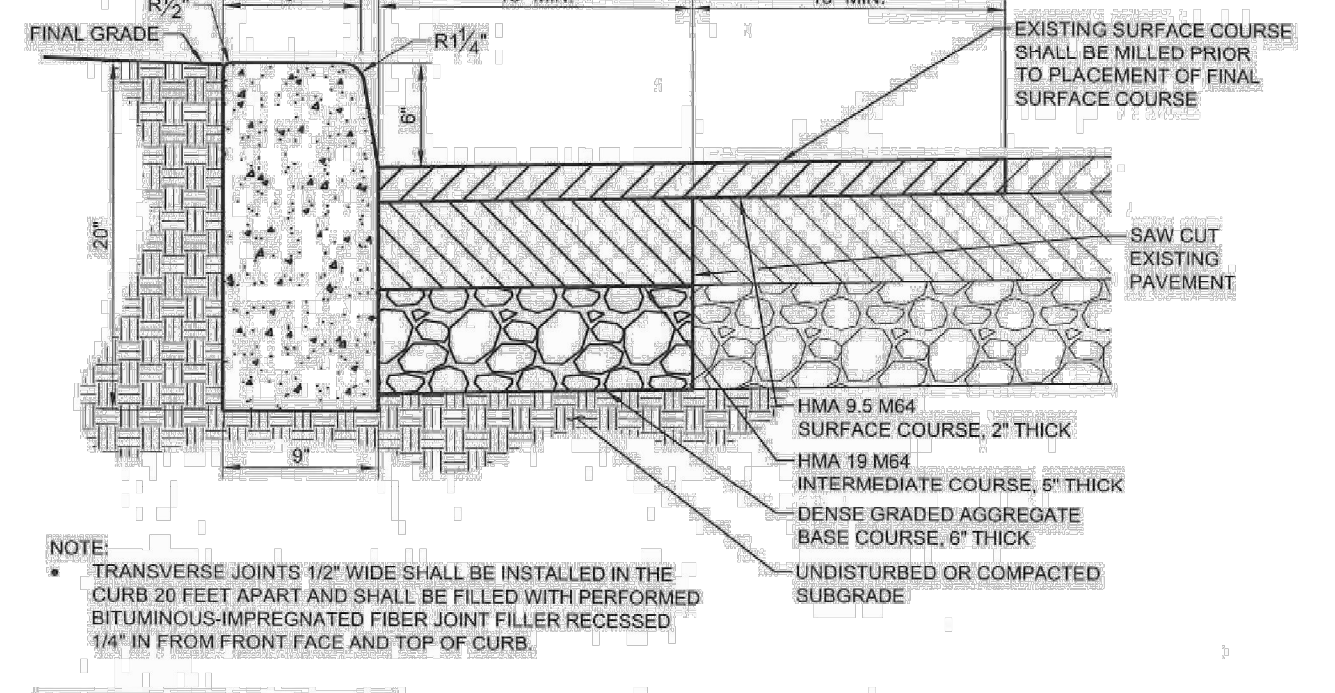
MORRIS COUNTY TYPICAL DETAIL CONCRETE CURB DETAIL NOT TO SCALE 5/2011 MOC
